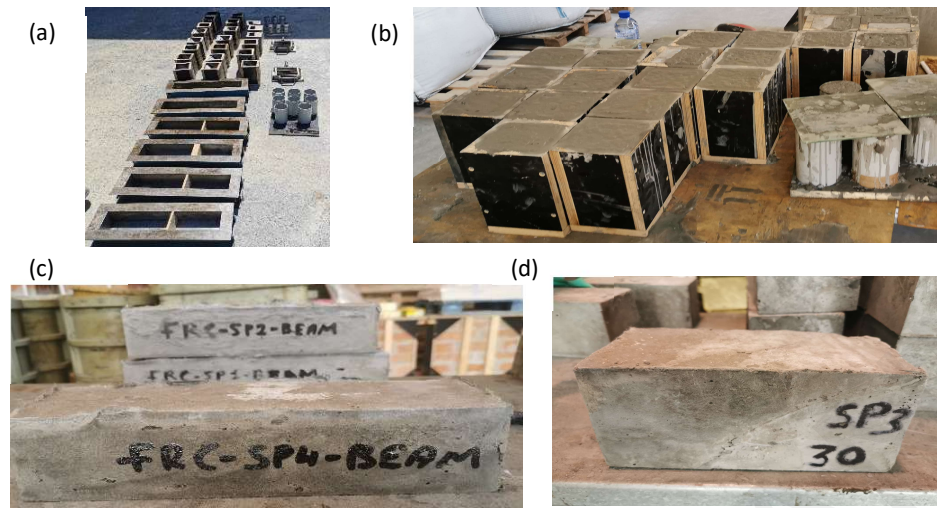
14: (a) PC parts placement into the molds; (b) Casting of ECC; (c) and (d) experimental specimens
